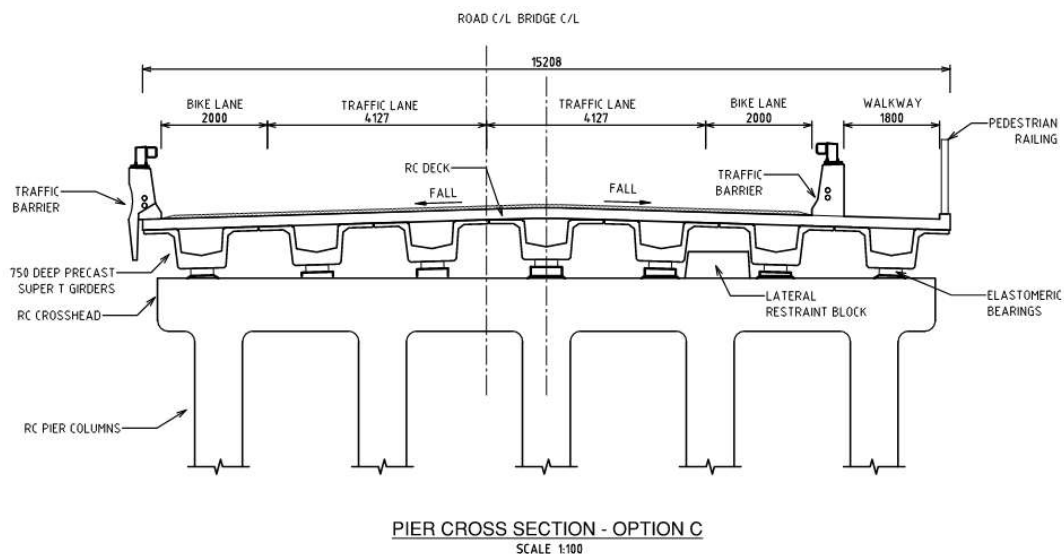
Edwards Bridge Renewal: Option C – Typical elevation and section
